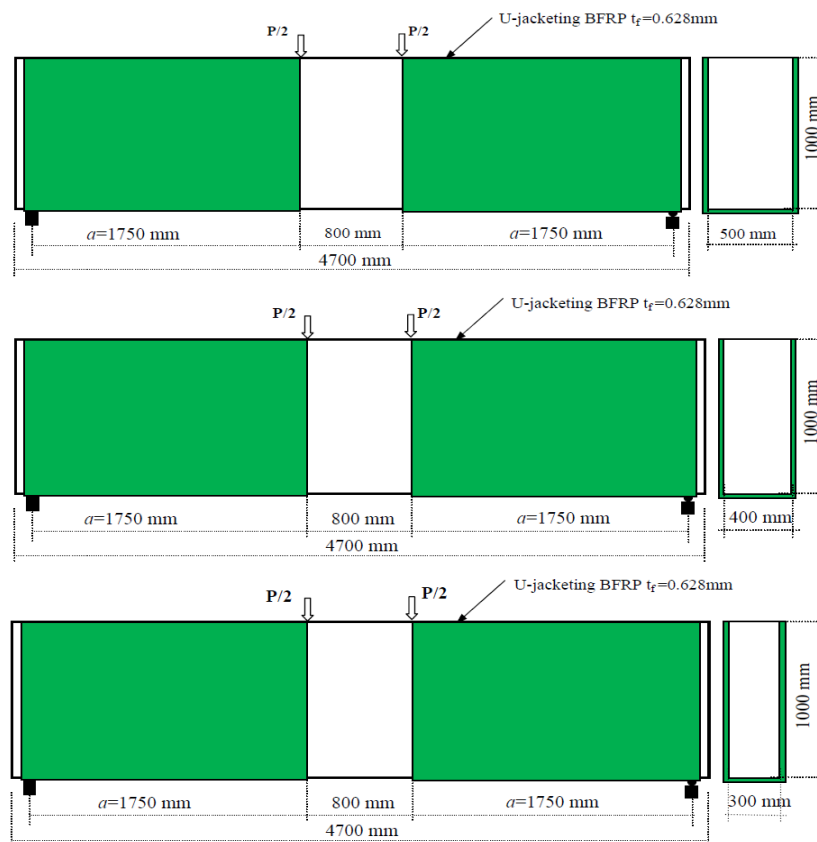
Geometrical details of the RC beams strengthened with U-jacketing
